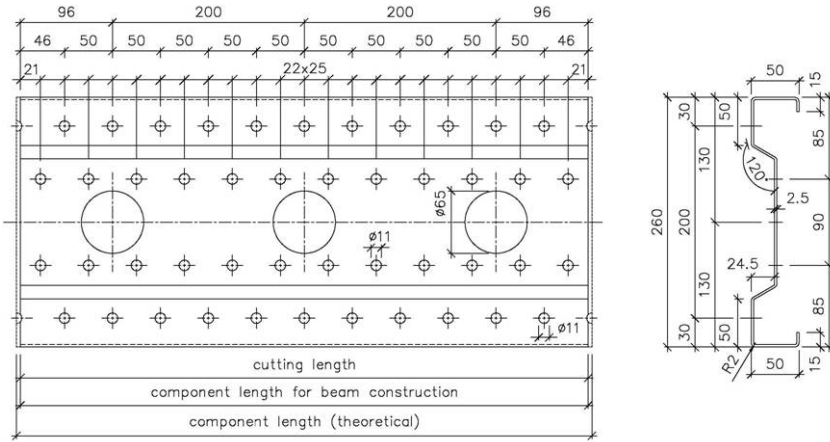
Arrangement of a segment of the steel Sigma-cross-section beam.
